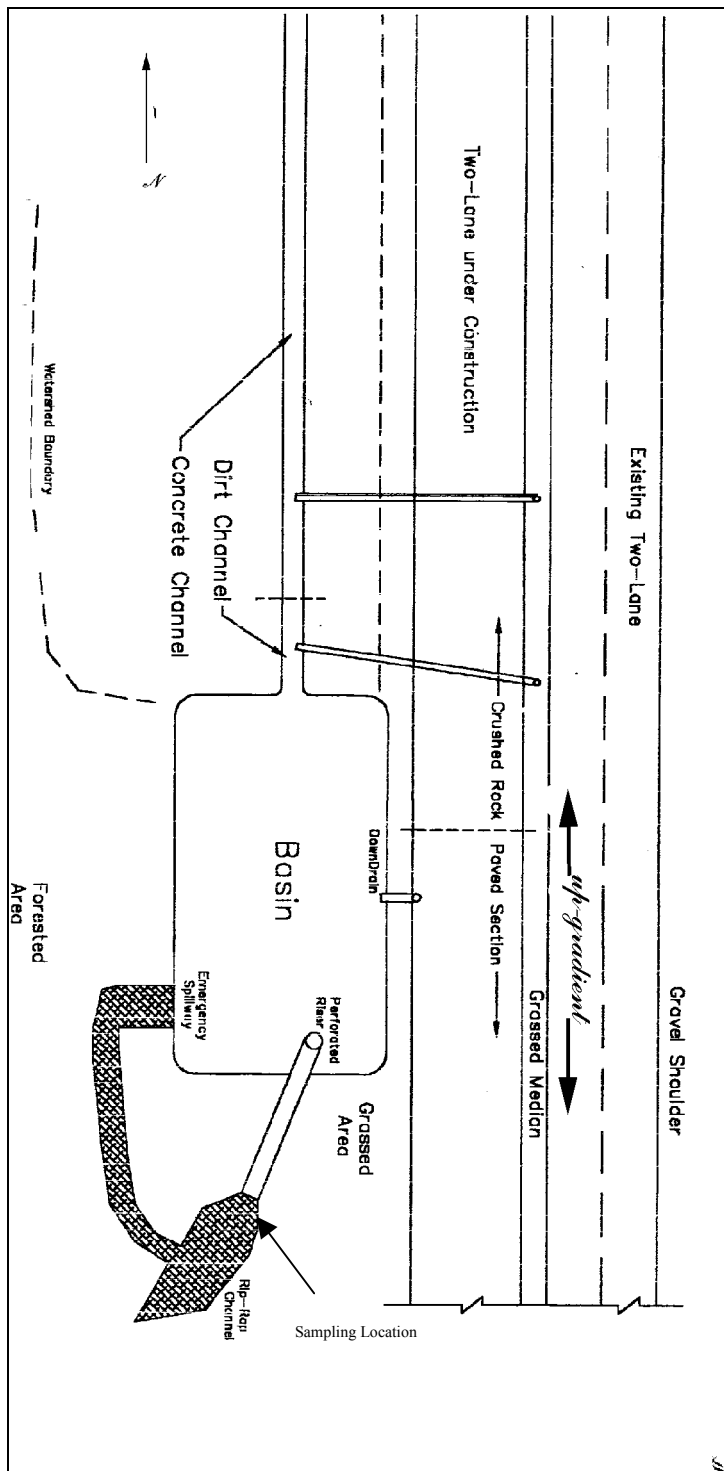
26 Schematic drawing of the highway current practice site and monitoring location.
